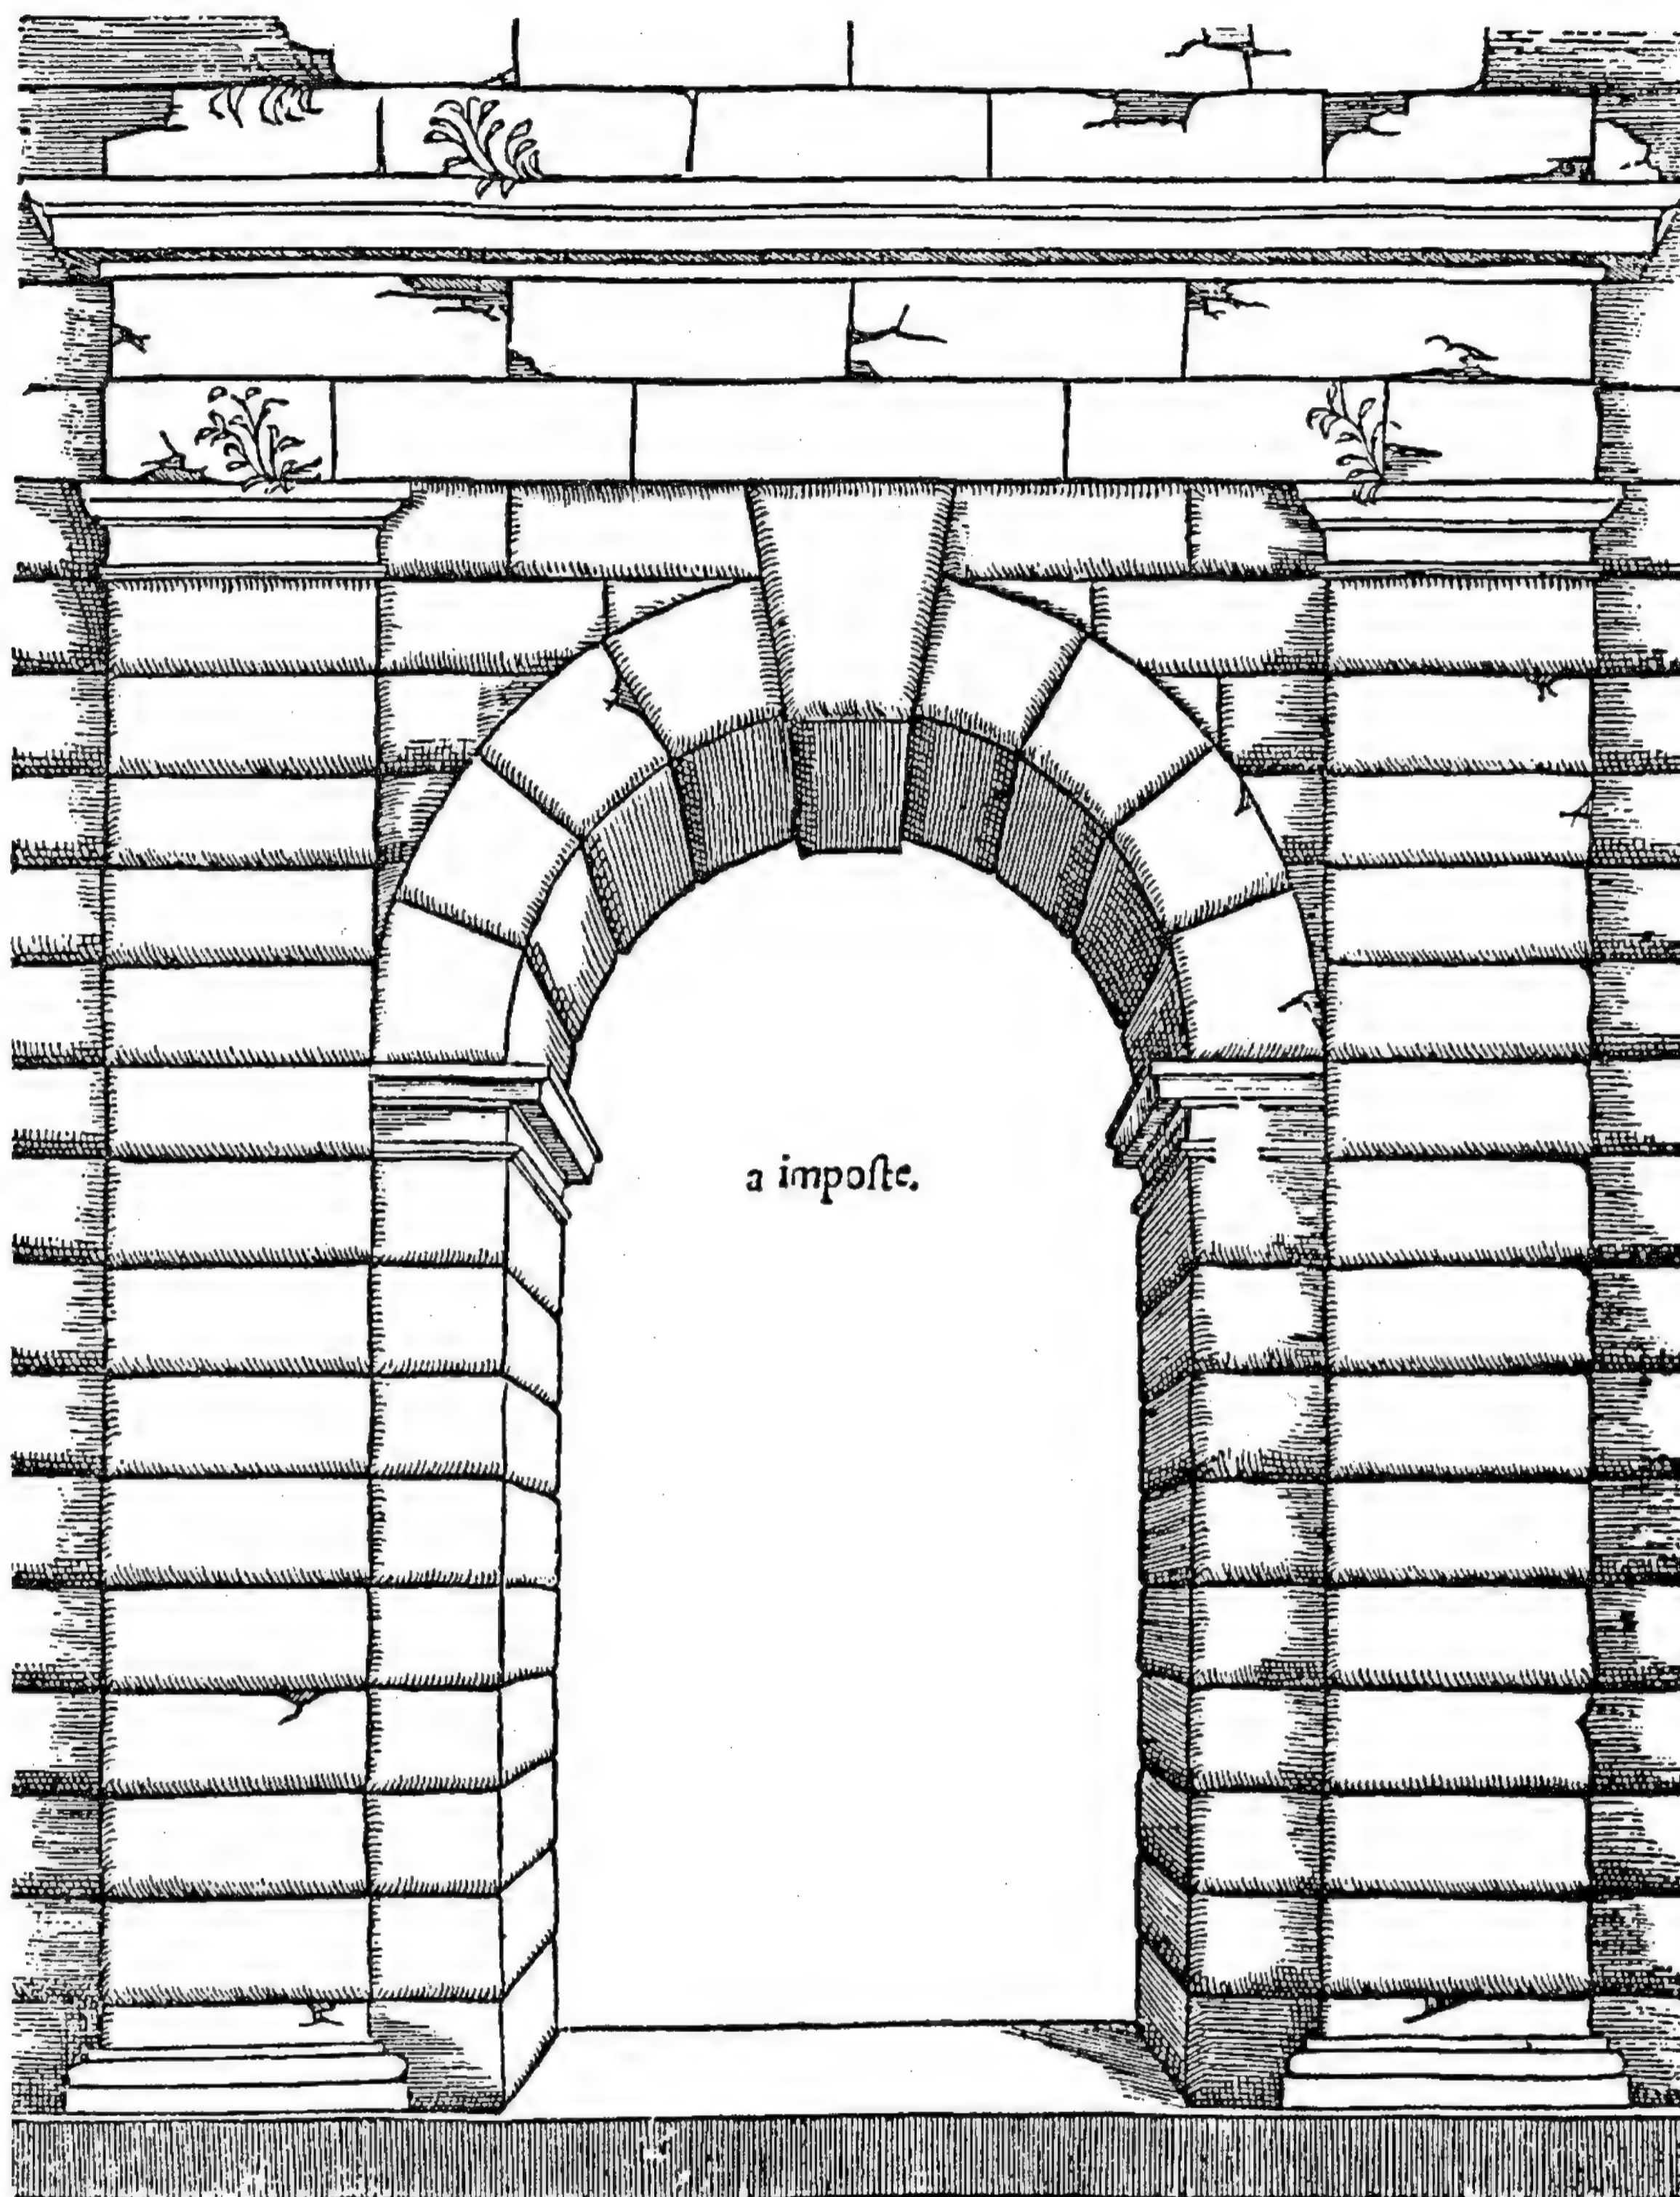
Gateway in Tuscan or Rustic style, from Serlio, The fourth Booke. Rules for Masonry, or Building with Stone, made after the five manners or orders of Building ... (London, 1611), f. 8v.
